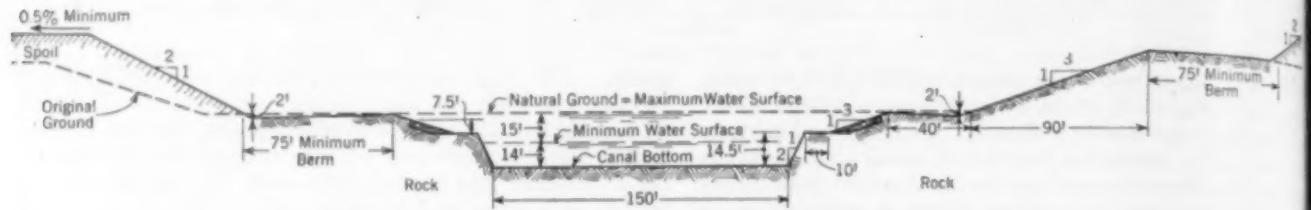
TYPICAL CROSS SECTION OF THE CANAL IN ROCK CUT
